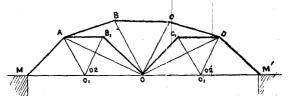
" Tarron Girder"—Showing Subsidiary Girders for Large Spans.
